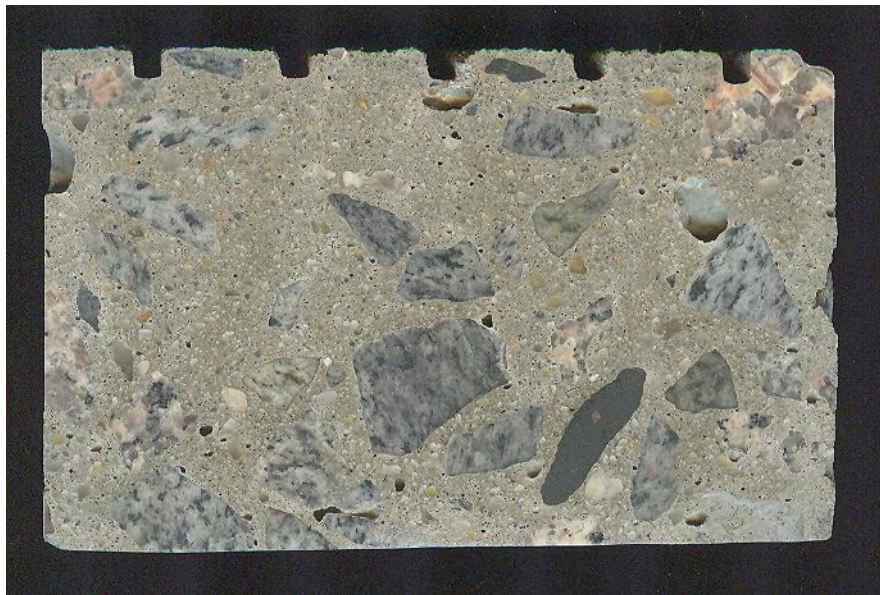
Scanned image of polished surface prepared from bridge deck 2N, core C-7. Bridge deck surface is at top.
